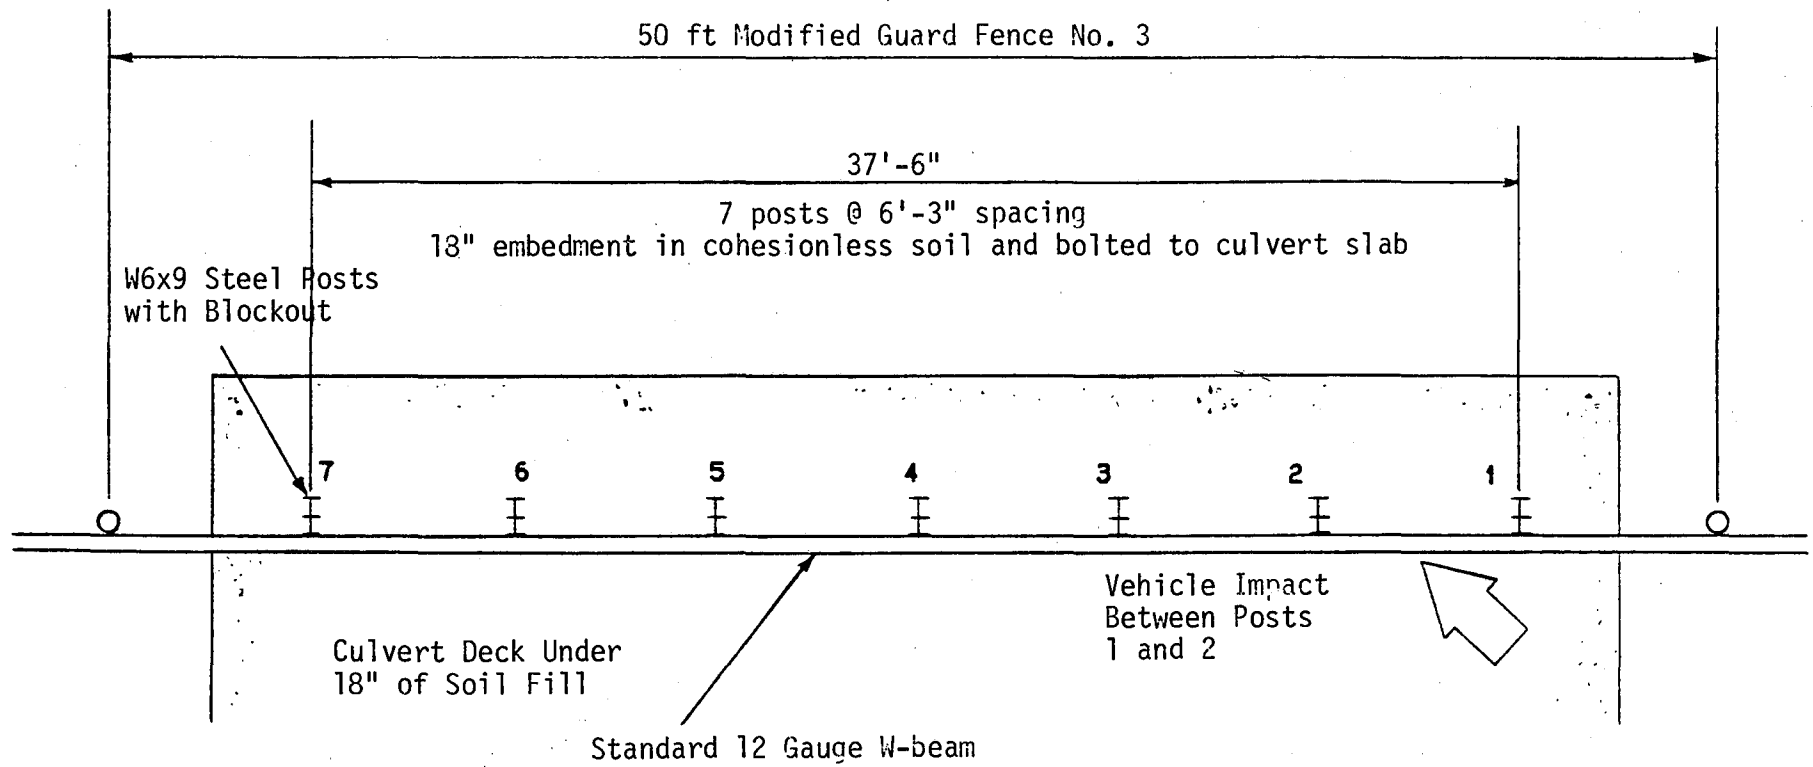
PLAN VIEW OF MODIFIED GUARD FENCE NO. 3 INSTALLATION FOR CRASH TEST 3.
